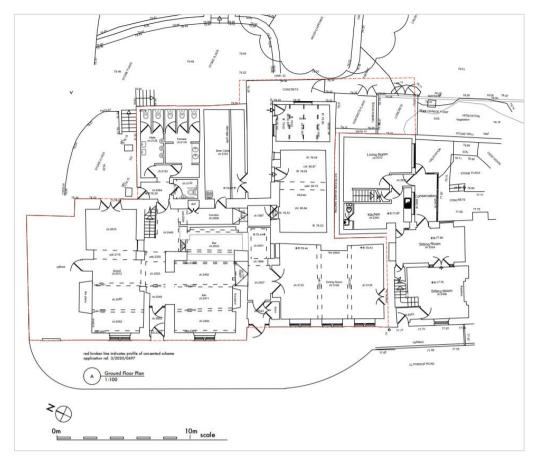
Existing ground floor plan (2023) – the red dotted line indicates the footprint of the extended building as approved in 2017 but yet to be fully completed
